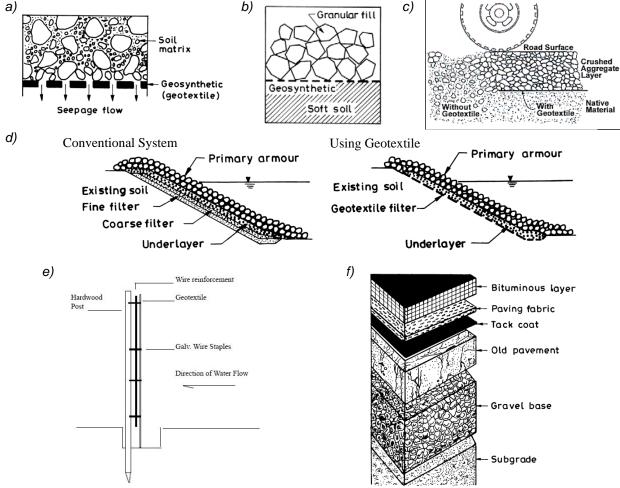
Conventional applications of geotextiles in pavement systems: a) Subsurface Drainage; b) Separation; c) Stabilization; d) Permanent Erosion Control; e) Temporary Silt Fence; f) Paving Fabric (Shukla and Yin 2006)
